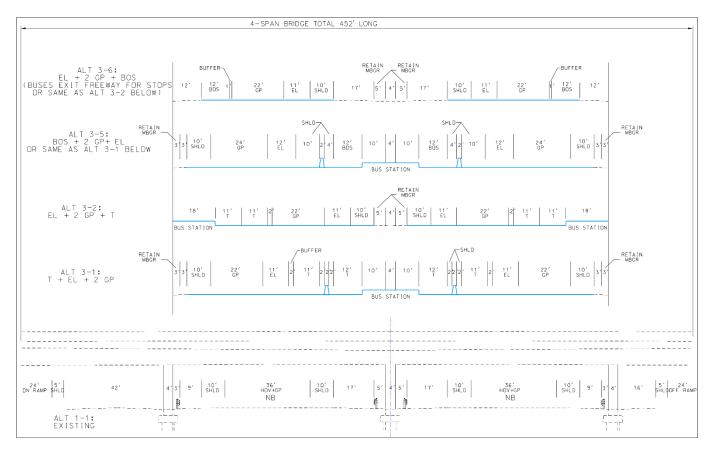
Bascom Avenue Transit Station Geometric Cross Sections
